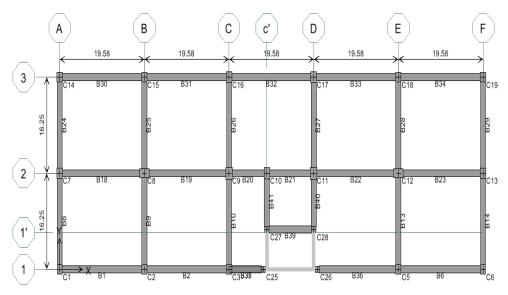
Column-beam layout Plan (all dimensions are in feet)
